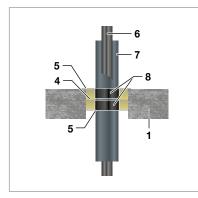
Soft firestop in the solid ceiling with Viega piping system plastic
